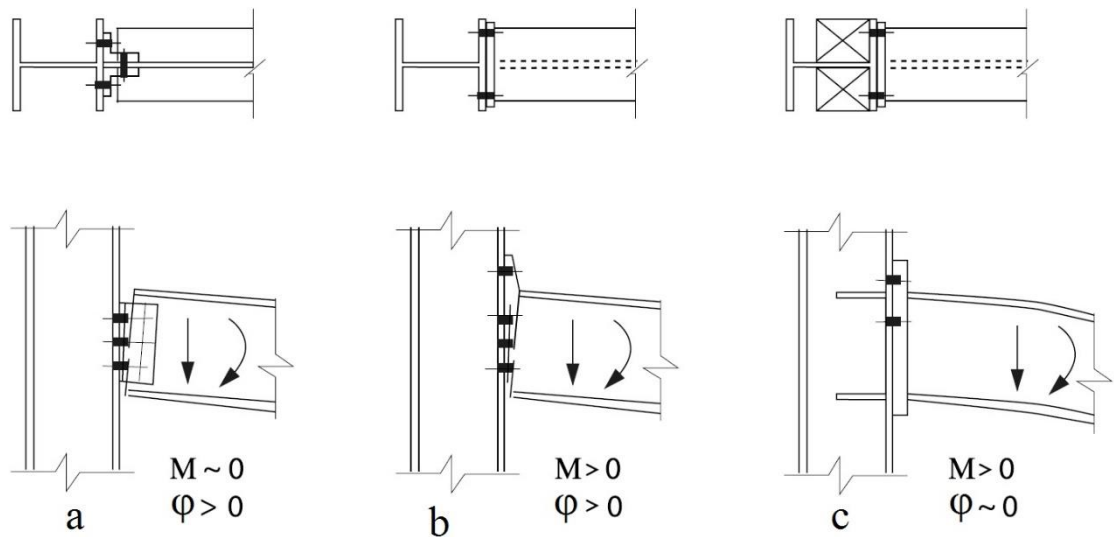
An example of the beams to the columns junction: a - the hinged; b - semi-rigid; c – rigid; M - bending moment; φ - sectional rotation angle
